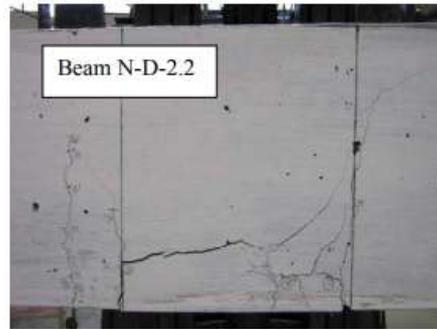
The Failure Crack Pattern of Normal Strength Geopolymer Concrete Beams Observed across the Splice Region (D-Series)
